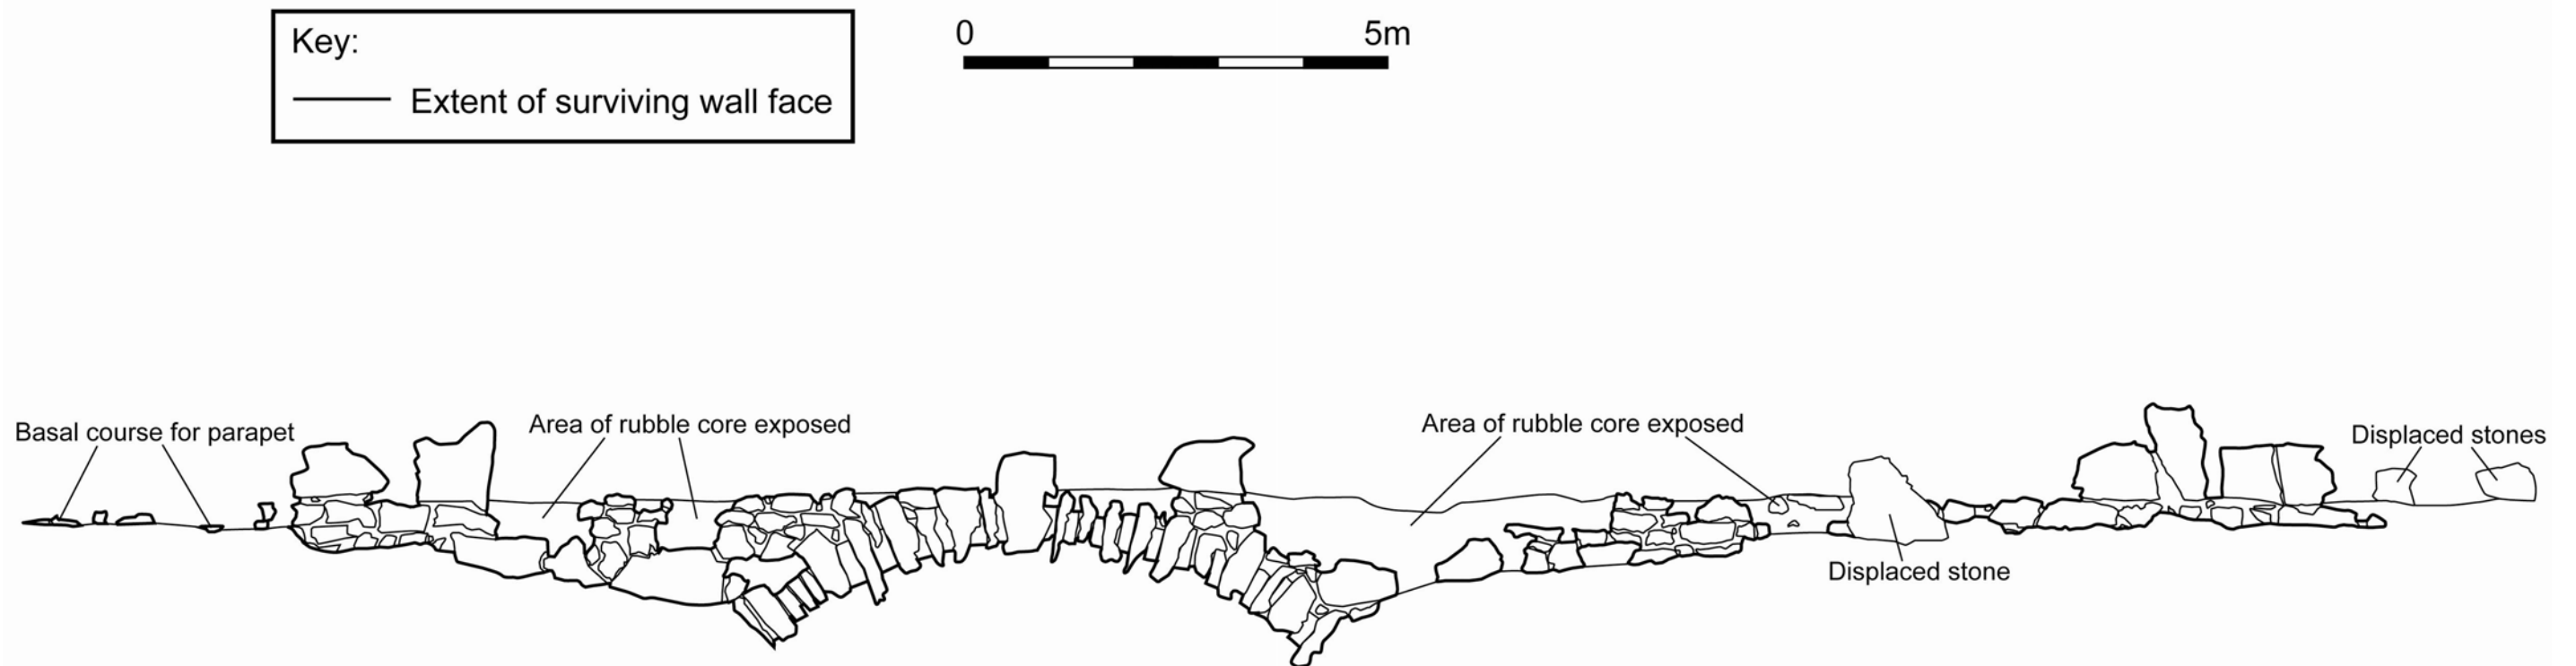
; Structure 3, Rusticated Bridge #1 (Upper Bridge) – Elevation d
